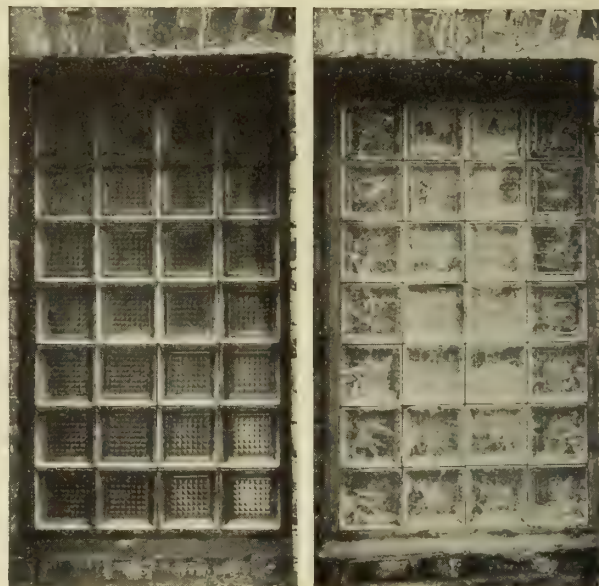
Before and after Fire Test of Keppler Windows: Heat raised to 1800° Fahr. in half hour and maintained for next half hour; construction then subjected to a force of water from fire hose and stood test intact
